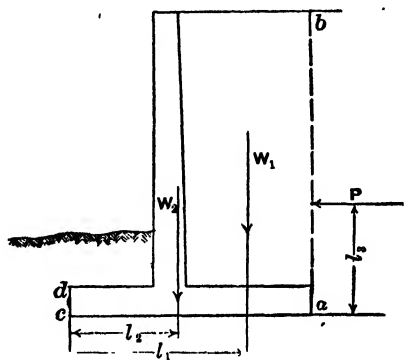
Forces Acting upon a Retaining Wall and their Moment Arms. (See p. 667.)
